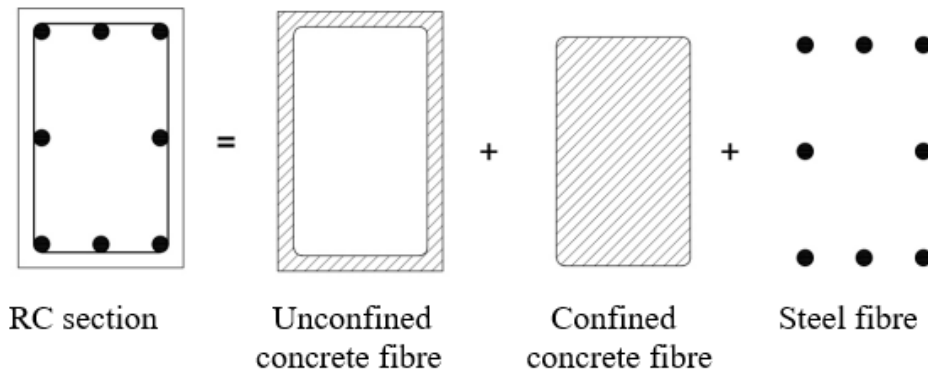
Fibre modeling of a conventional beam or pillar in a confinement frame
